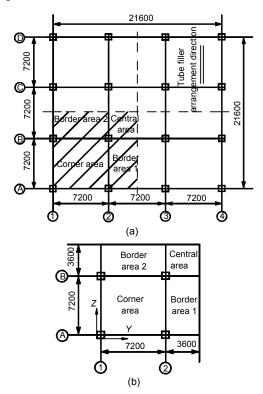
Floor system model indicating four kinds of typical areas (unit: mm)
